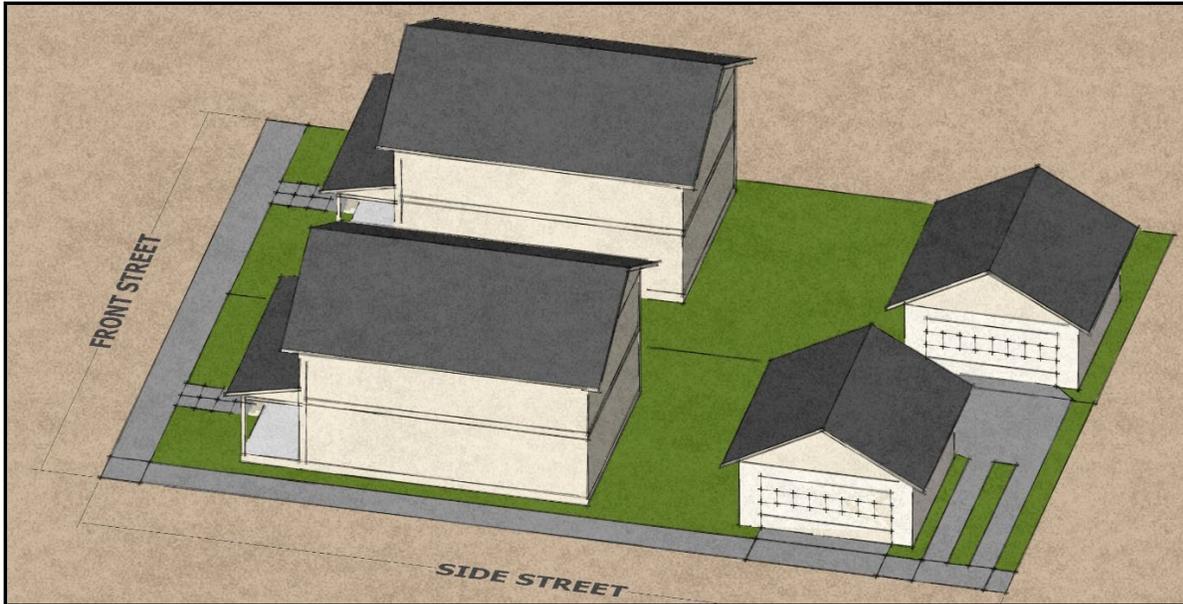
Example Providing Access to Side Street via Easement/Lot Configuration
